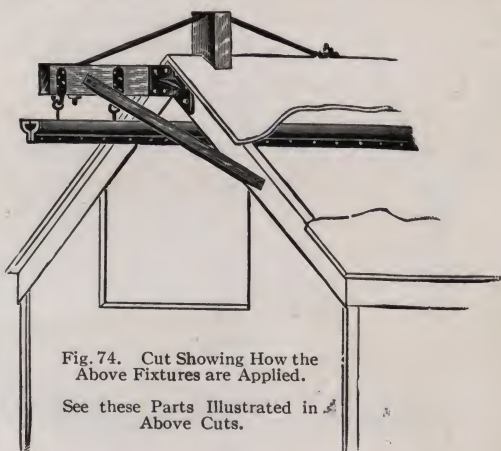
Cut Showing How the Above Fixtures are Applied.
